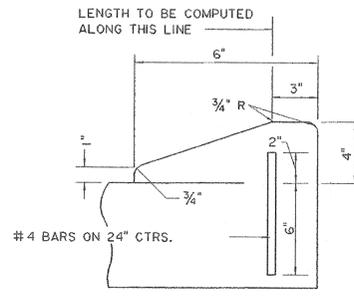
DETAIL "G" TRANSVERSE JOINT AT CATCH BASIN
